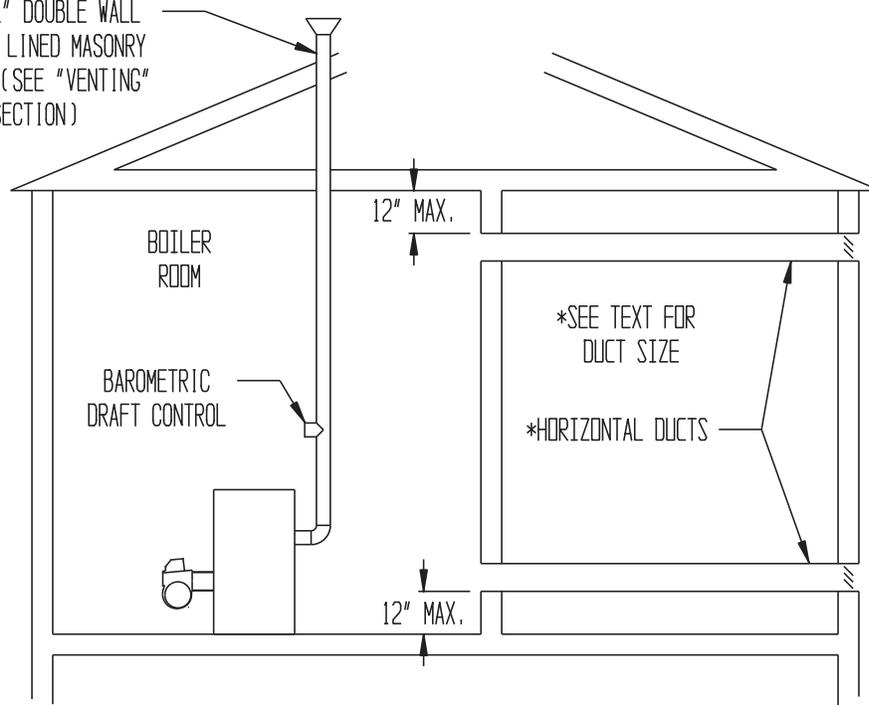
ALL AIR FROM OUTDOORS, USING HORIZONTAL DUCTS INTO BOILER ROOM
